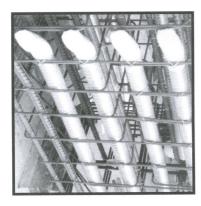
Column/Column Connection By Grouted Pipe Sleeves
